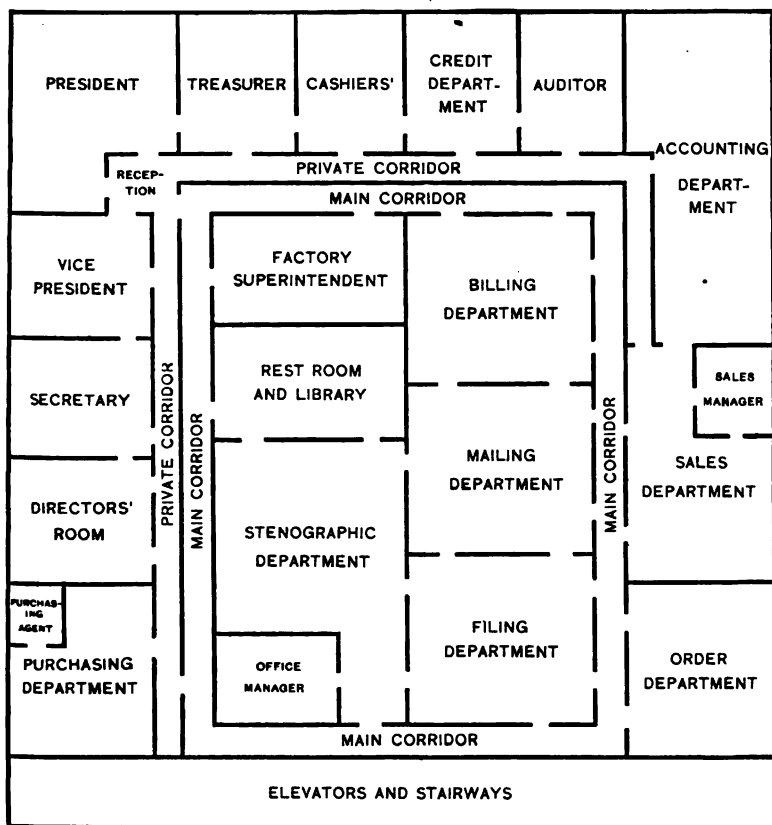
Floor Plan of Office in a New York Clothing Manufacturing Concern.
